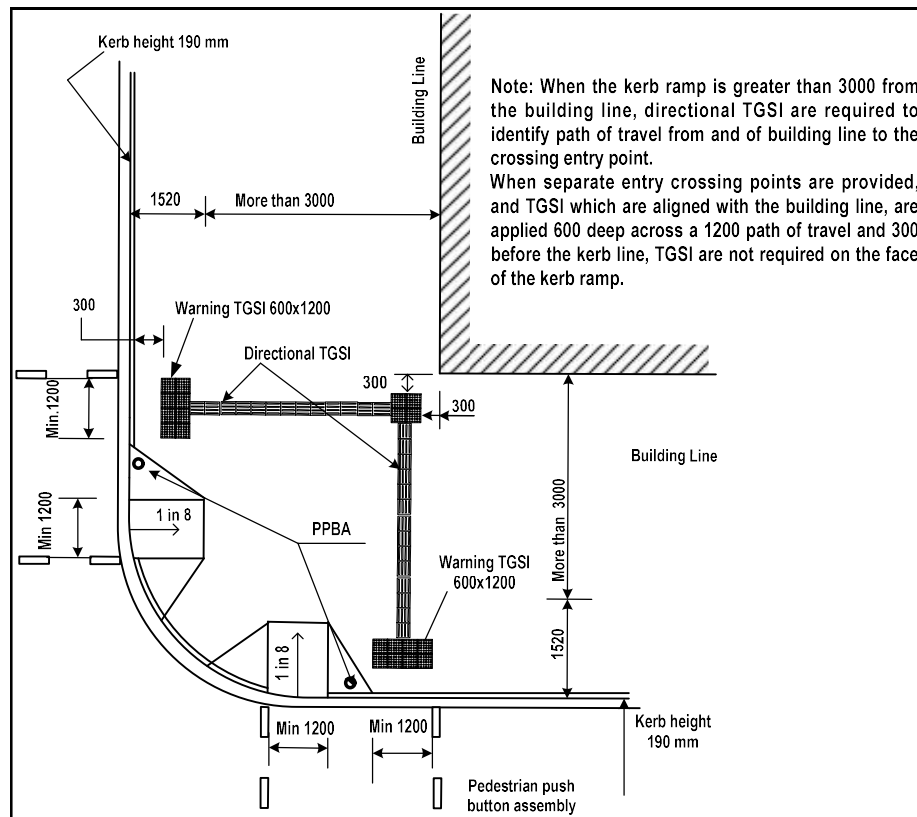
Right angle intersection, dual entry crossing points, 190 kerb height, 1:8 kerb ramp, top of the ramp greater than 3000 from the building line
